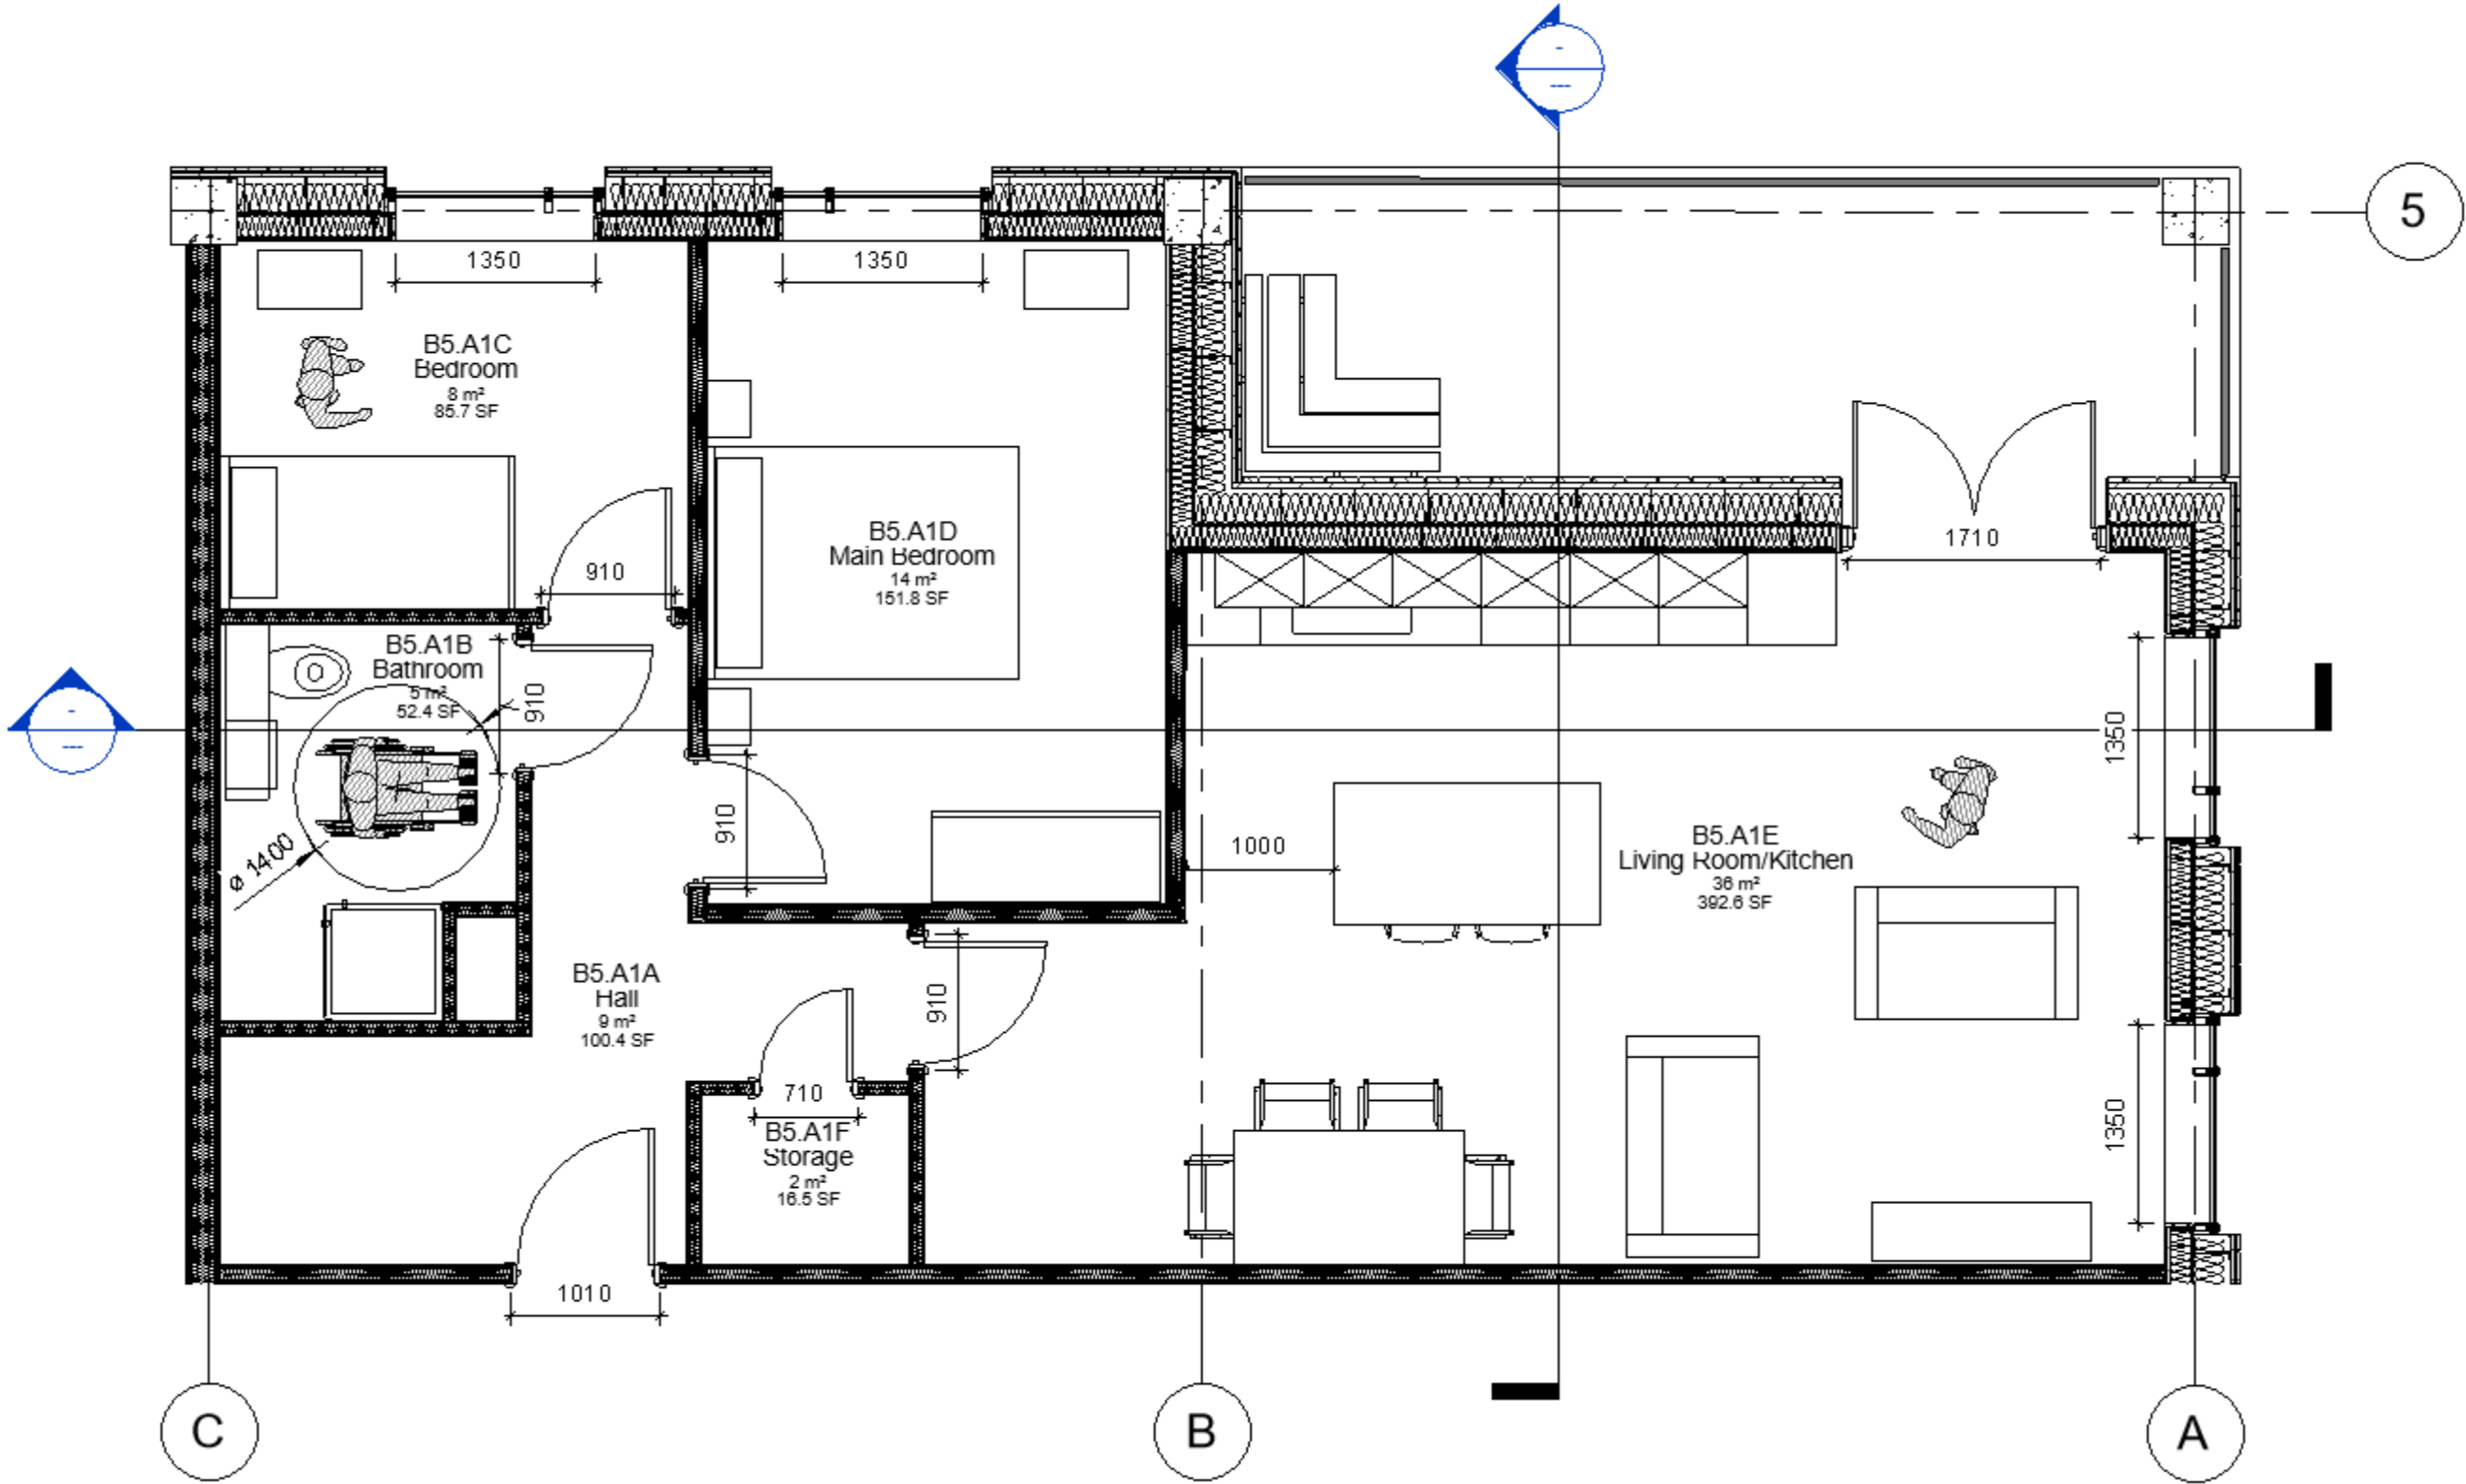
Enlarged Young-Old Apartment Plan (Author, 2021)
